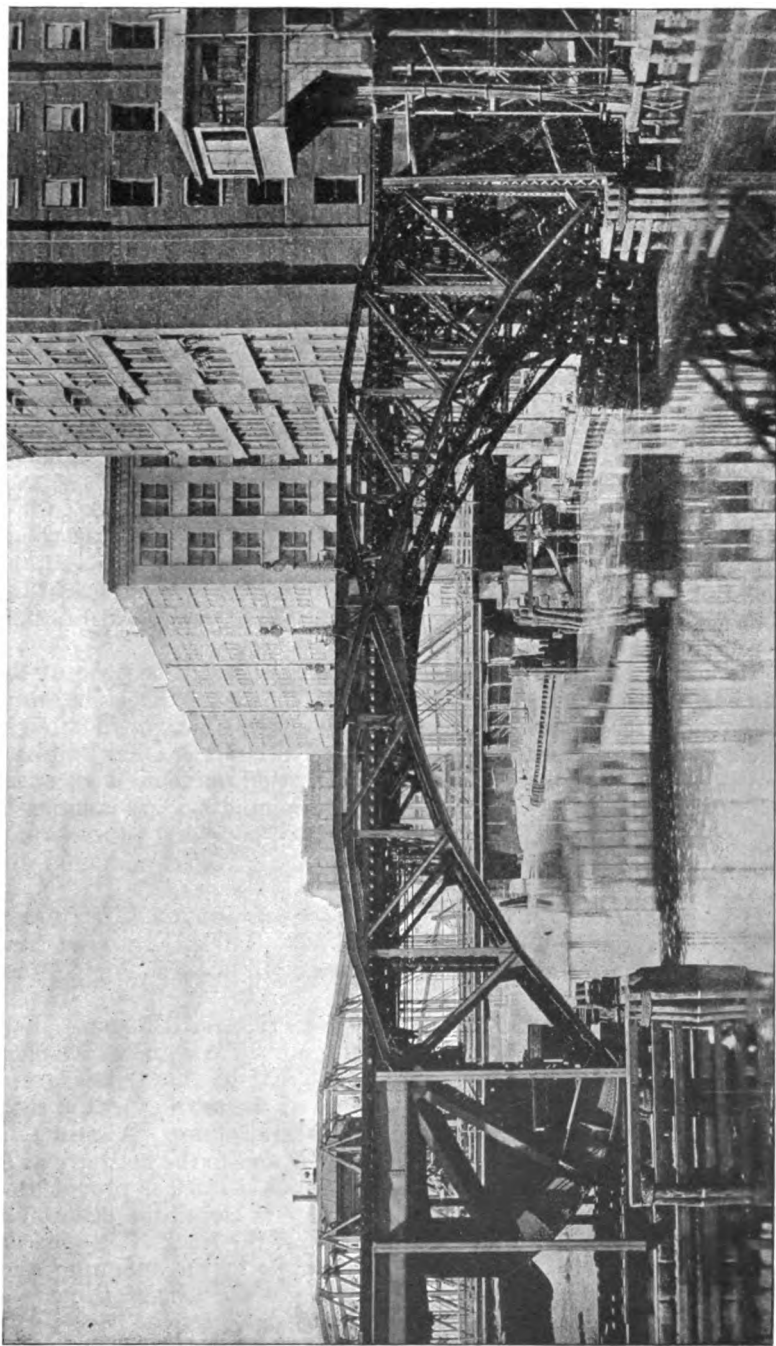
Metropolitan West Side Elevated Railway Crossing the South Branch of the Chicago River.
